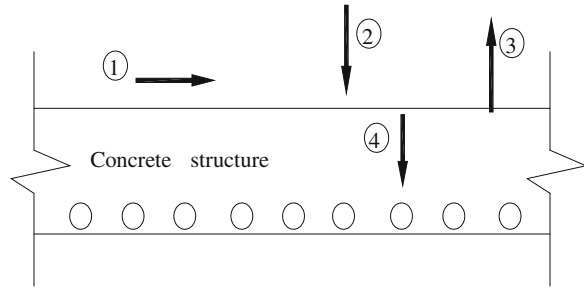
Schematic diagram of concrete pavement thermal energy storage system
